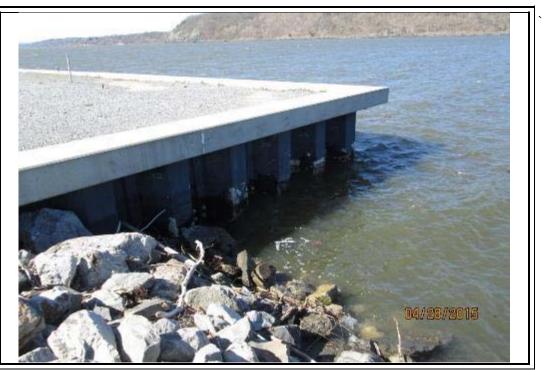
Looking southwest; northern end of Zone 1 bulkhead.
